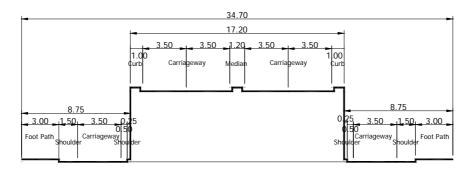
Proposed Cross Section for Flyover and Ramps
